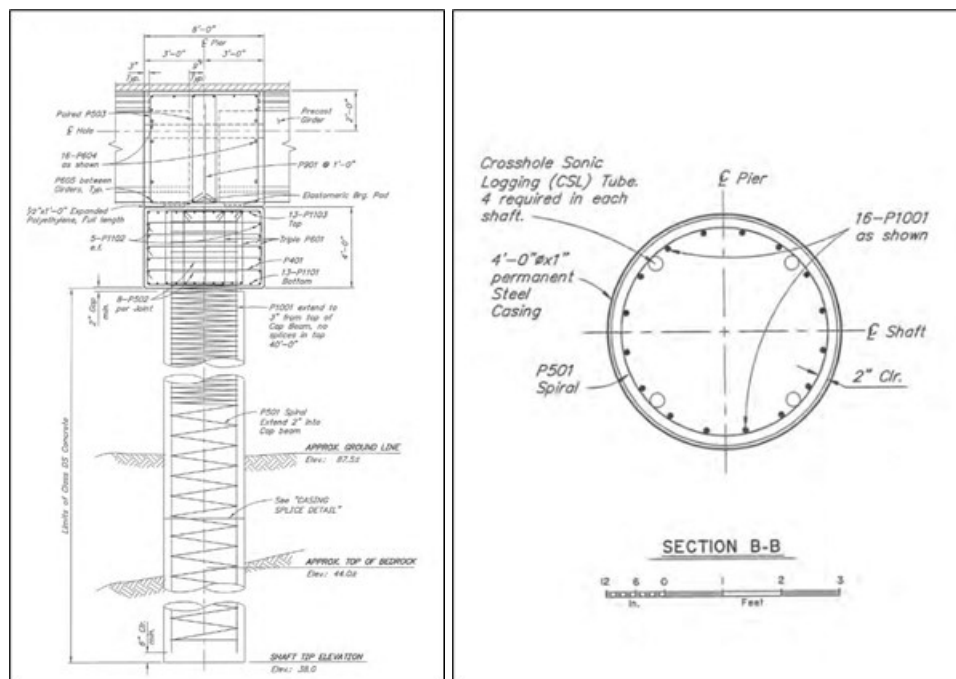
Old Glenn Highway Bridge Pier Profile (Left); Bridge Pier Section (Right).
